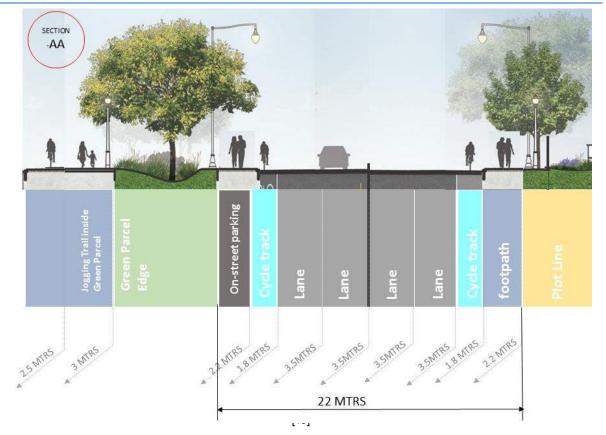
TYPICAL DESIGN OF ROAD ADJOINING THE RAILWAYS LAND
